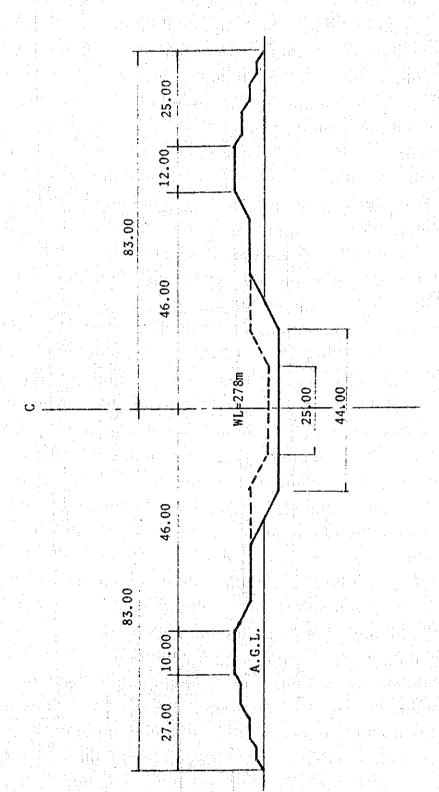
Cross Section of El Salam Canal at 48.75 Km in distance from the Dammiatta Outlet (after Mixing with Hadous Drainage Water)
